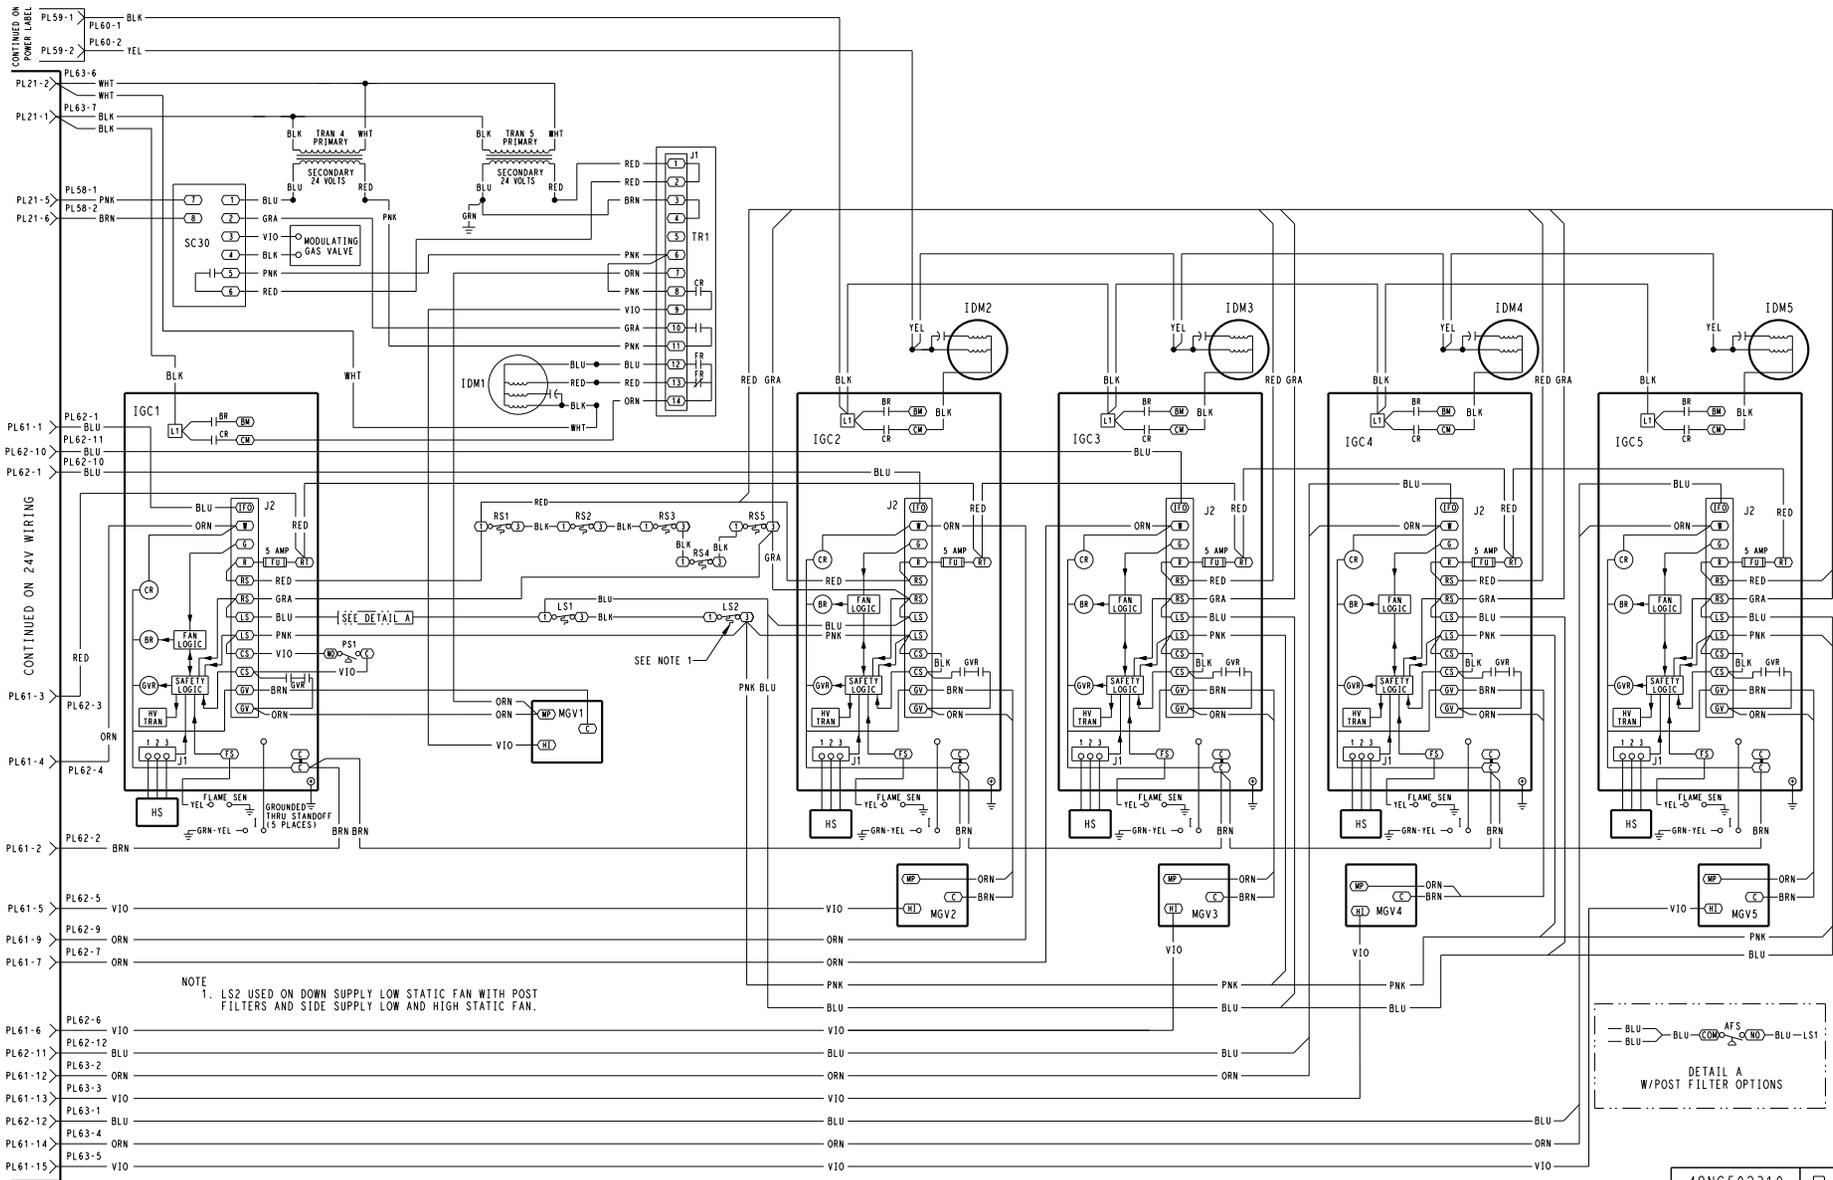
48N Typical Modulating Gas Heat Section Wiring (Nominal Ton 75 to 105, Low Heat Units)
